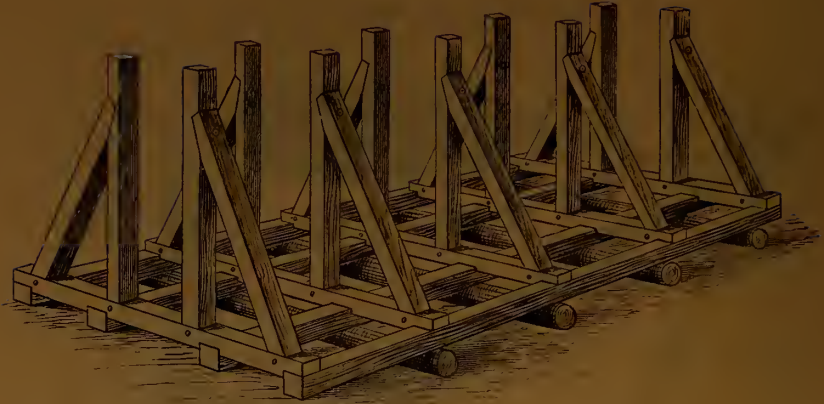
RACK FOR MOVING PLATE GLASS.
